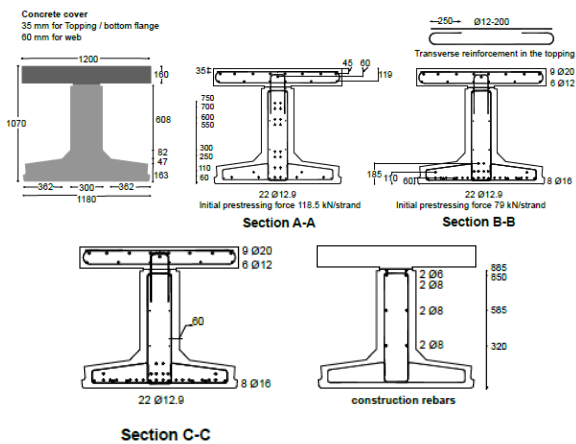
Cross-section and reinforcement arrangement for the beam S10H1A.
